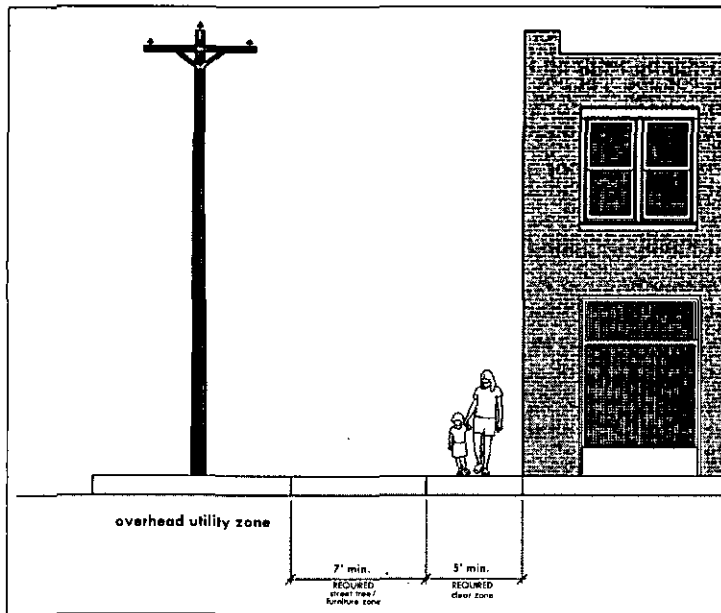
Above-Ground Utilities at Curb on Urban Roadway
